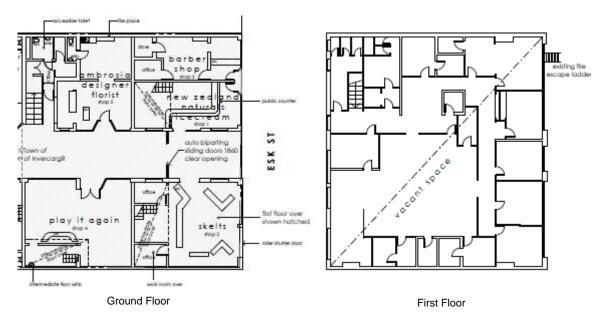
Building Floor Plans from 2010 drawing by Designbase Ltd.
